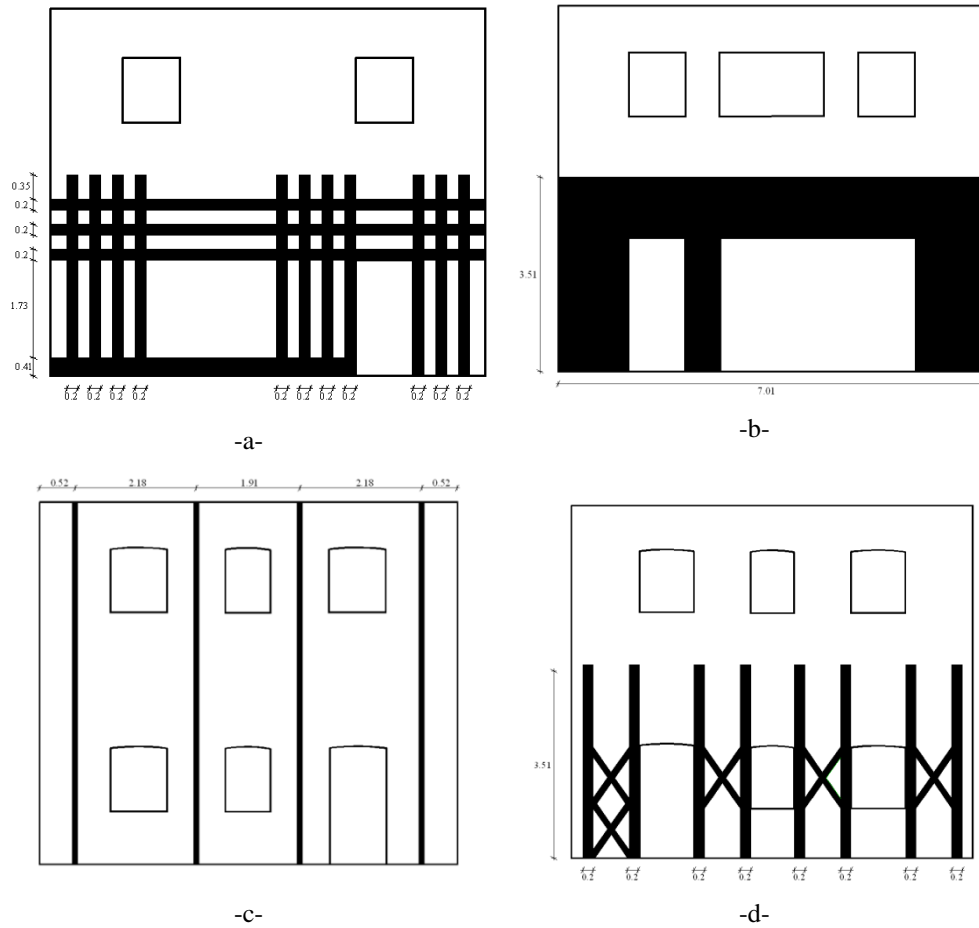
Reinforced masonry test structure: -a- Wall 1; -b- Wall 2; -c- Wall A; -d- Wall B
